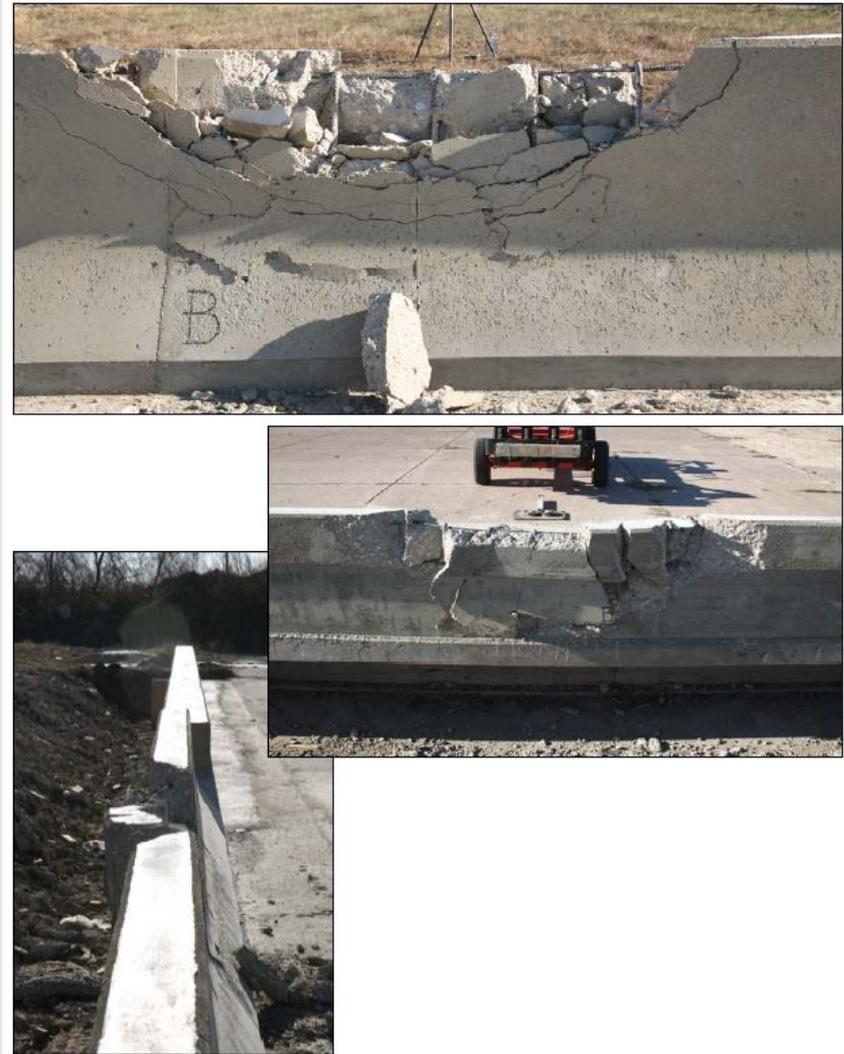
Bridge Rail T501 Retrofit/Repair at Location B after Test B8.
